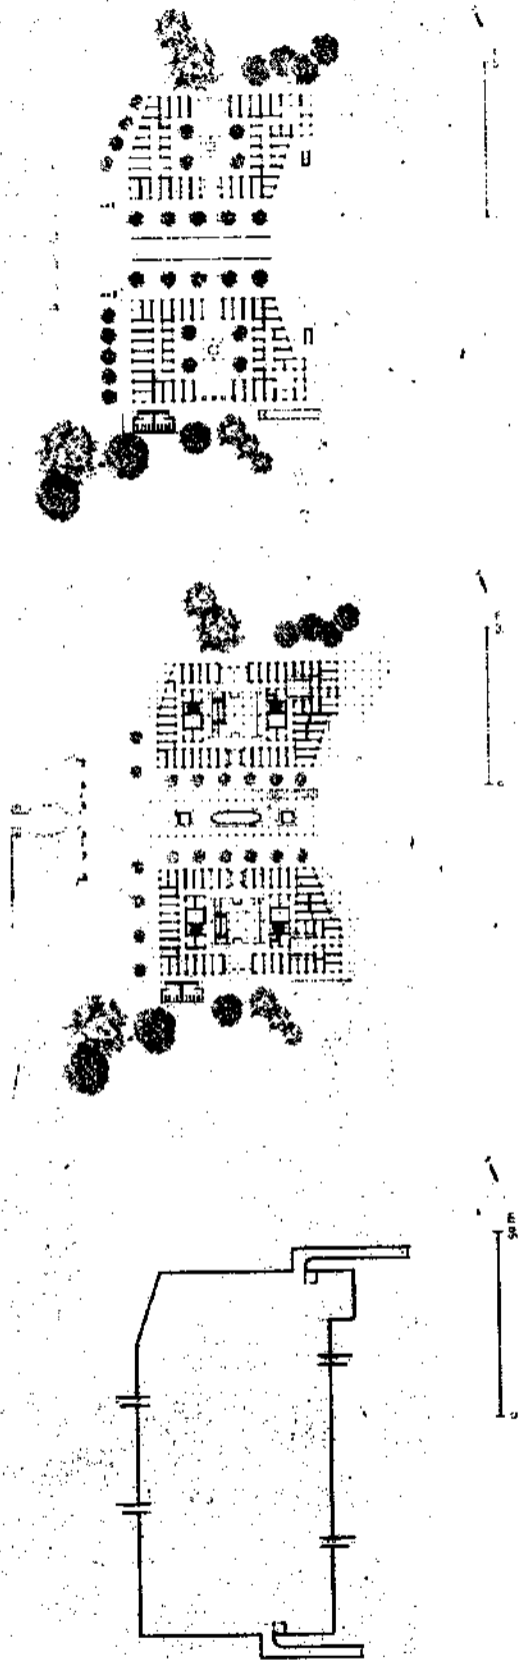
NEW MARKET AND UNDERGROUND PARKING
